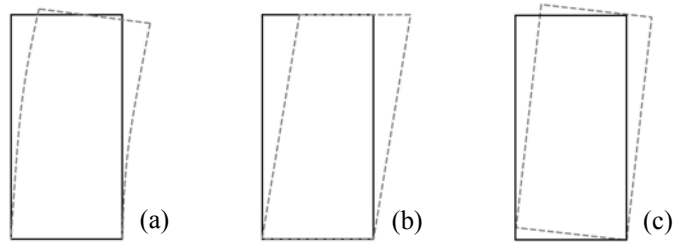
The three deflection components of a solid timber element, (a) bending, (b) shear and (c) anchorage slip (tilting).
